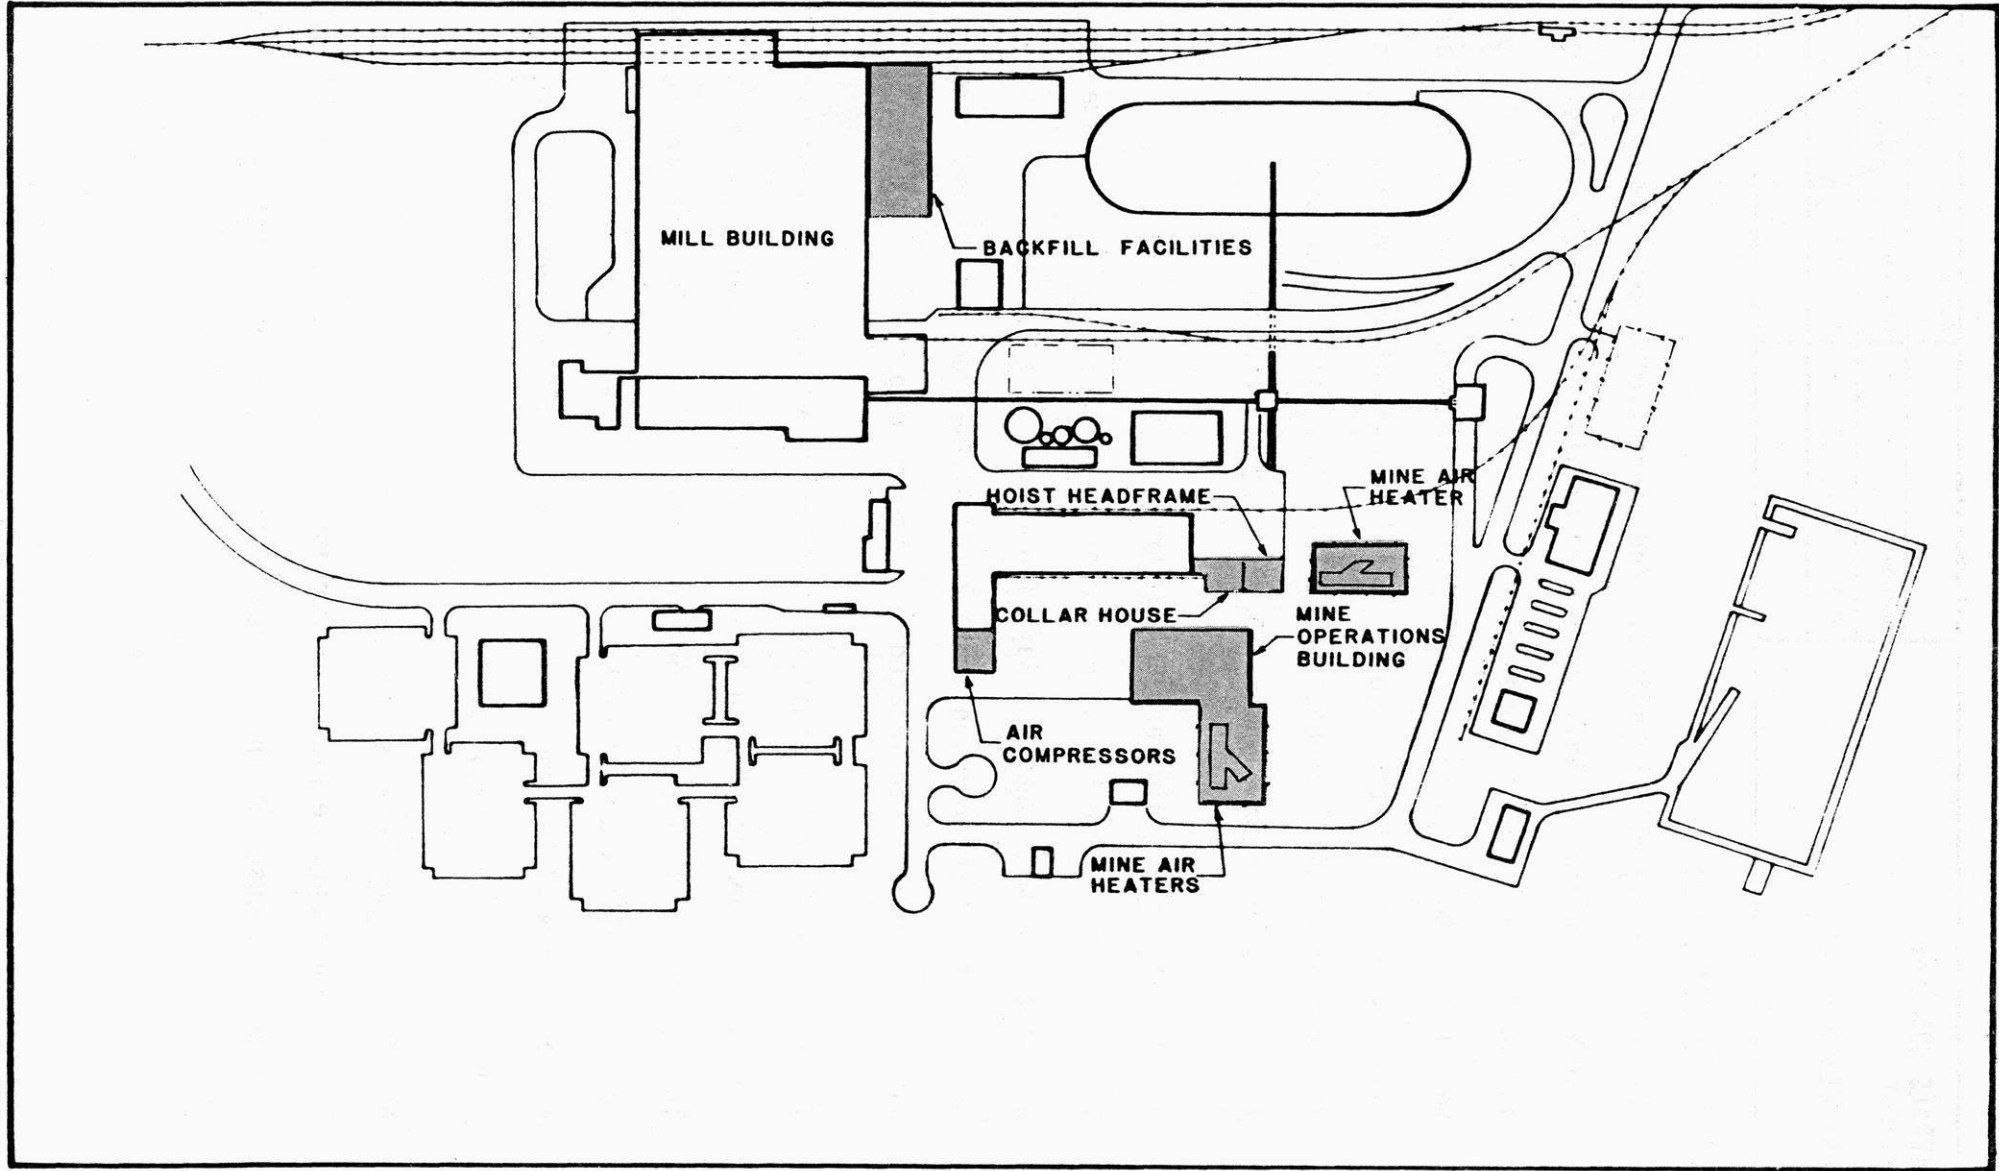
A schematic plan of possible Crandon Mine/Mill Facilities showing the mine surface facilities as shaded areas.
